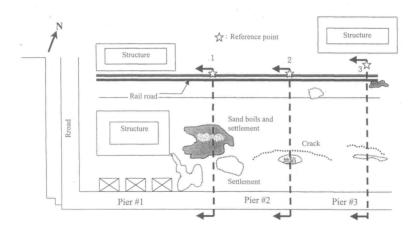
Damages observed in the area of Pier #1 to #3 [3]
